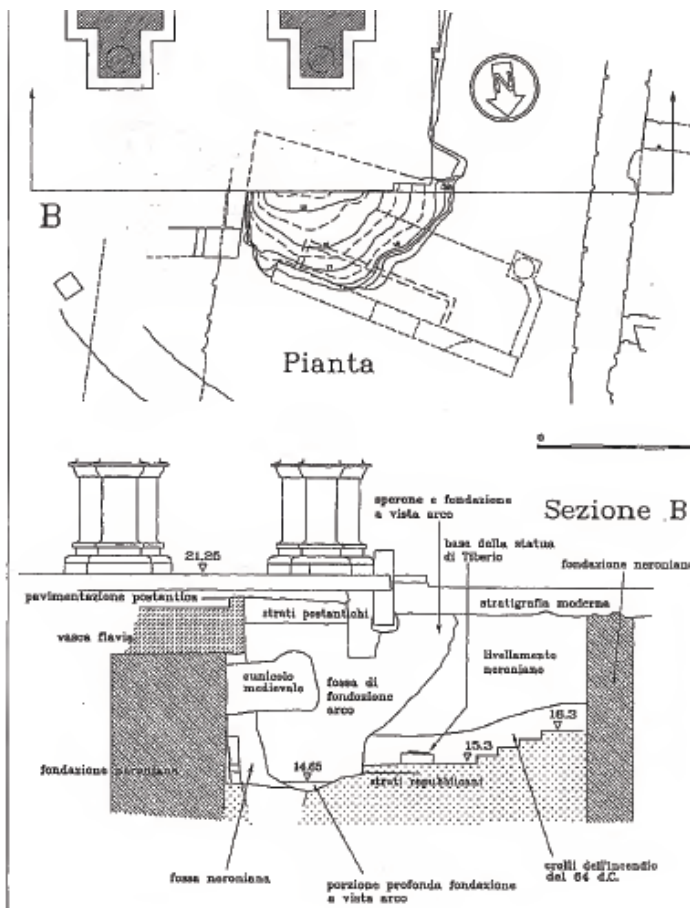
Schematic reconstruction in plan and section E-W, view from the N [2].
